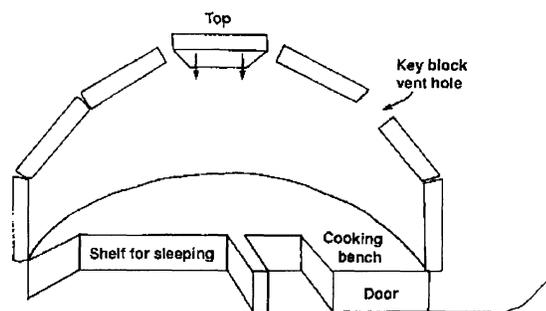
Alaskan Igloo Construction. Side view showing arrangement of roof blocks, shelf for sleeping and cooking, and door.
